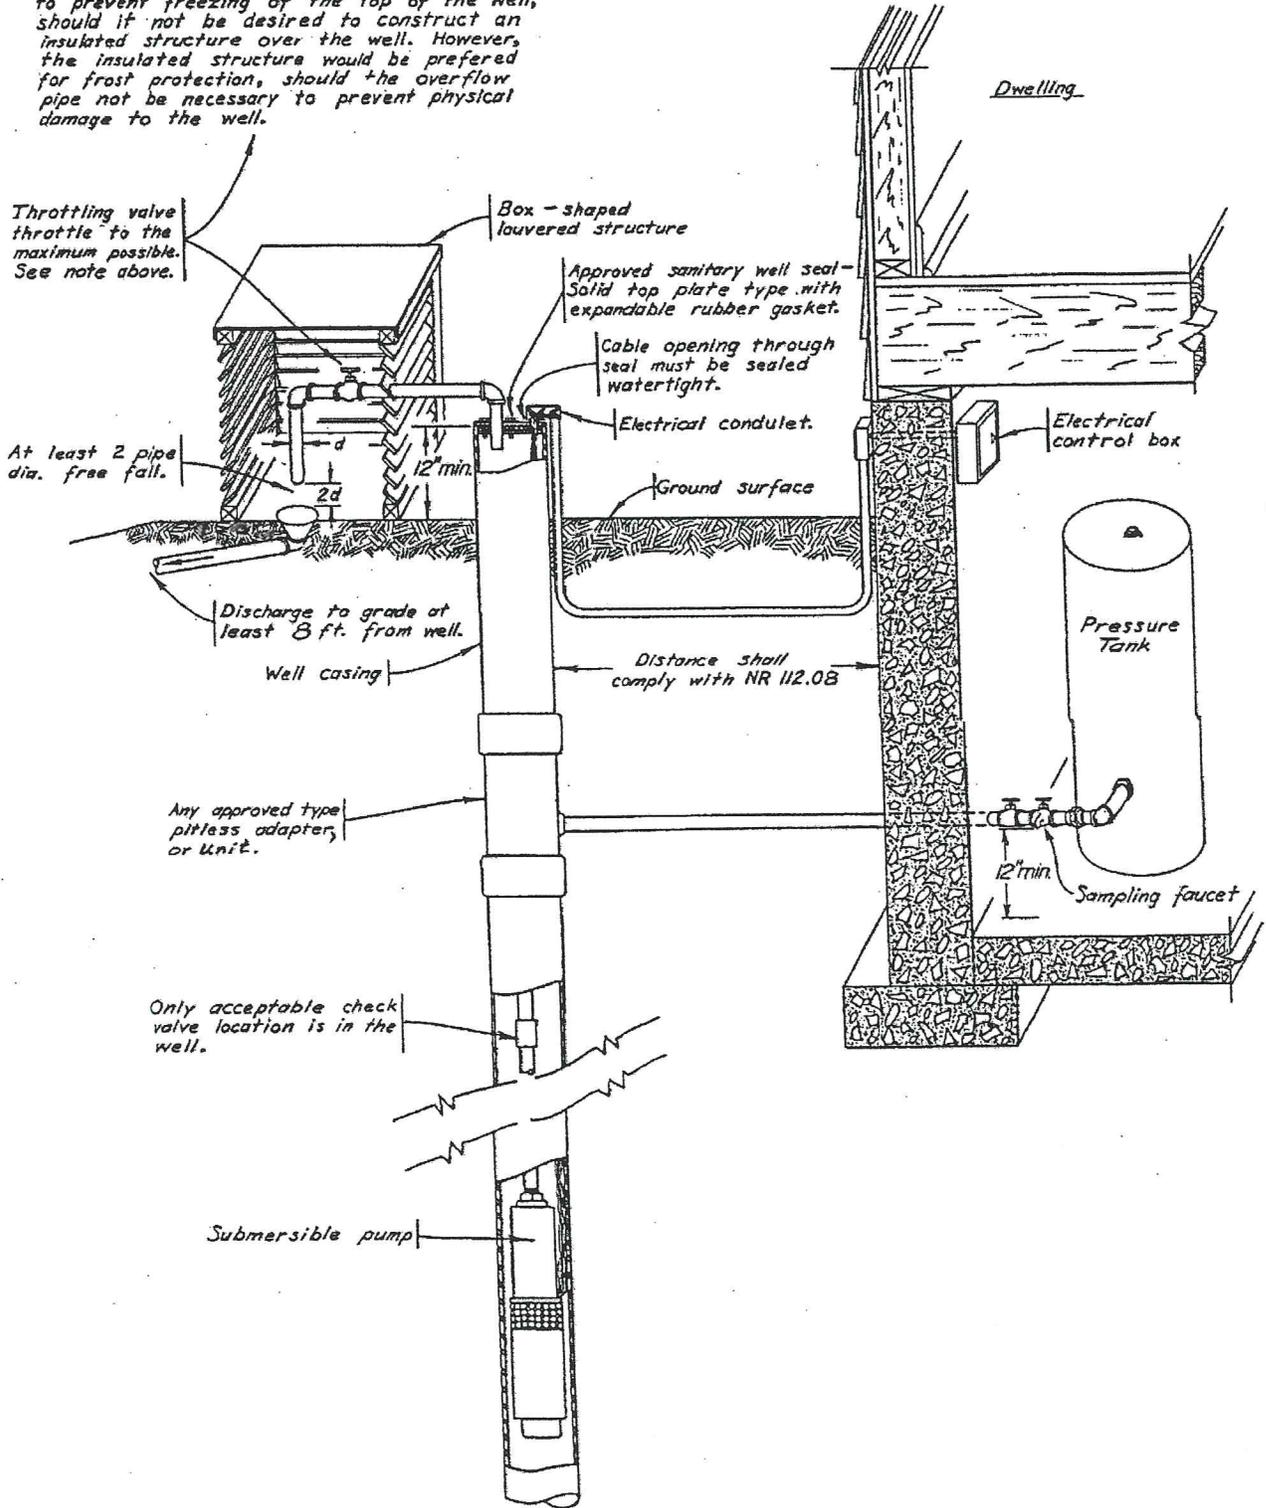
Overflow piping arrangement for a flowing well with a submersible pump.
